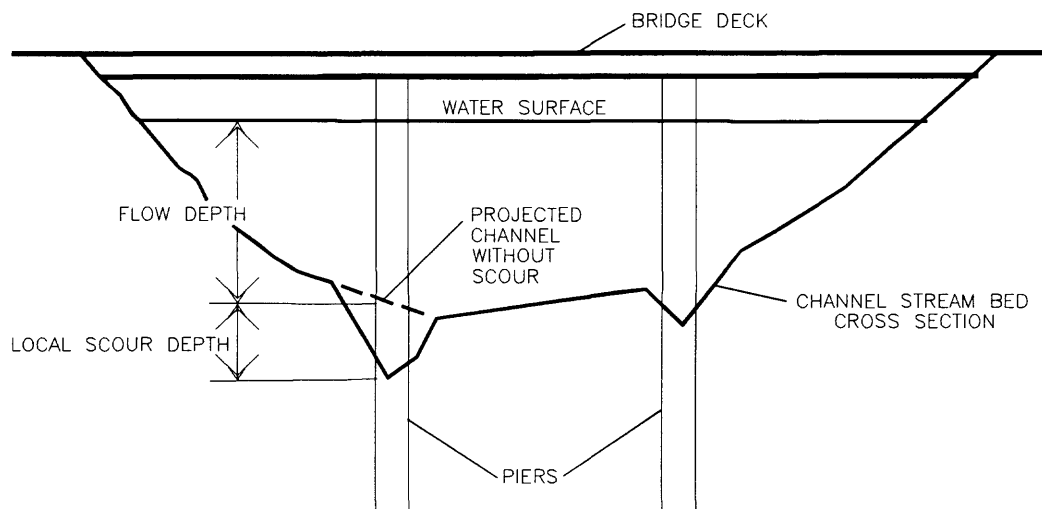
Flow depth and local scour depth at a bridge pier for a typical channel cross section.
